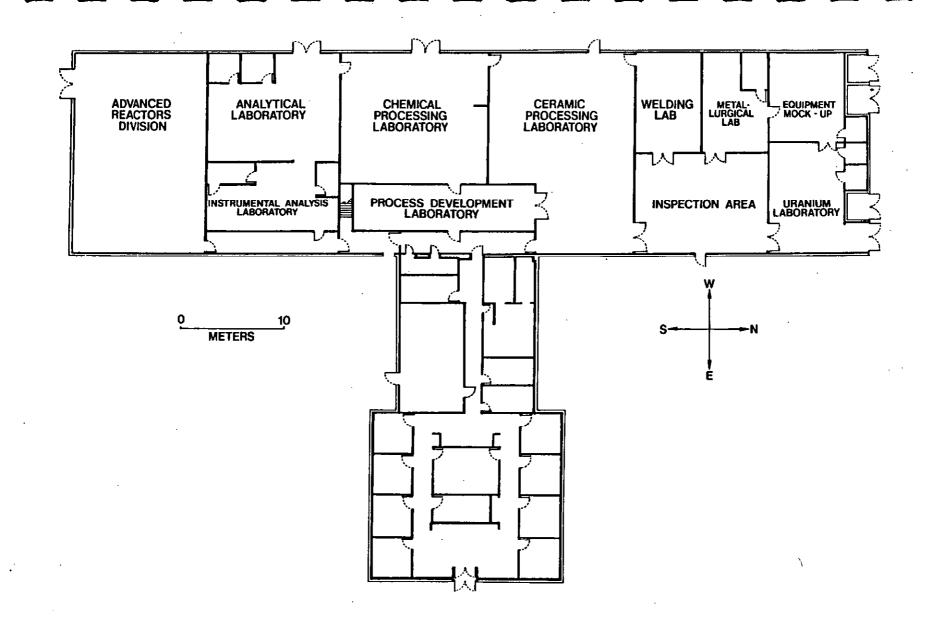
Floor Plan of the Main Laboratory Area of Building 8 Showing Original Room Layout.
